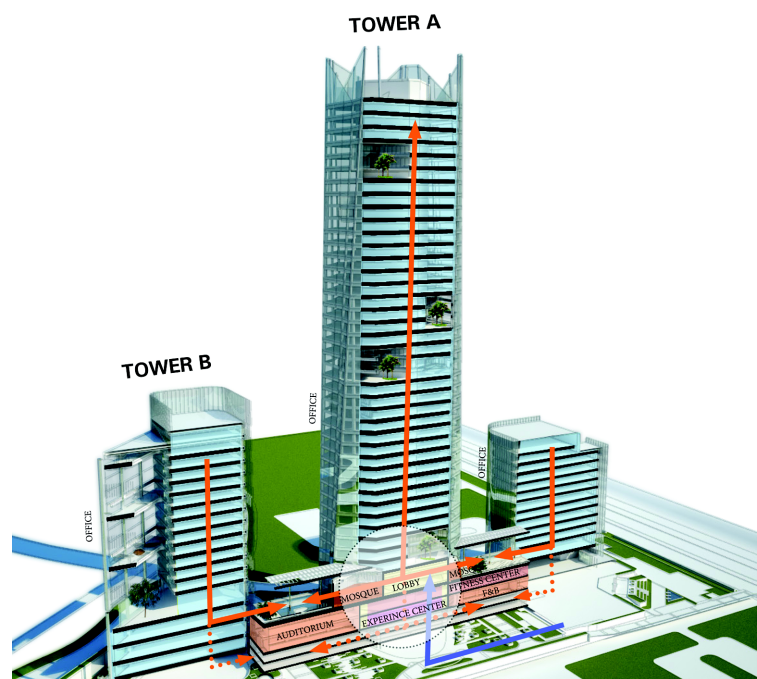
Vertical and horizontal connectivity through the Telkom campus. Towers A and B are connected to the existing building on site through a common podium structure. (Source: Woods Bagot).
